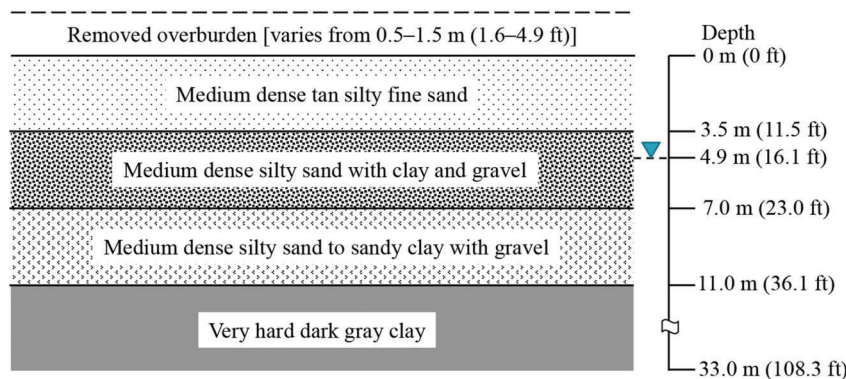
Soil profile at Texas A&M footing load test site (modified from Briaud & Gibbens, 1997).
